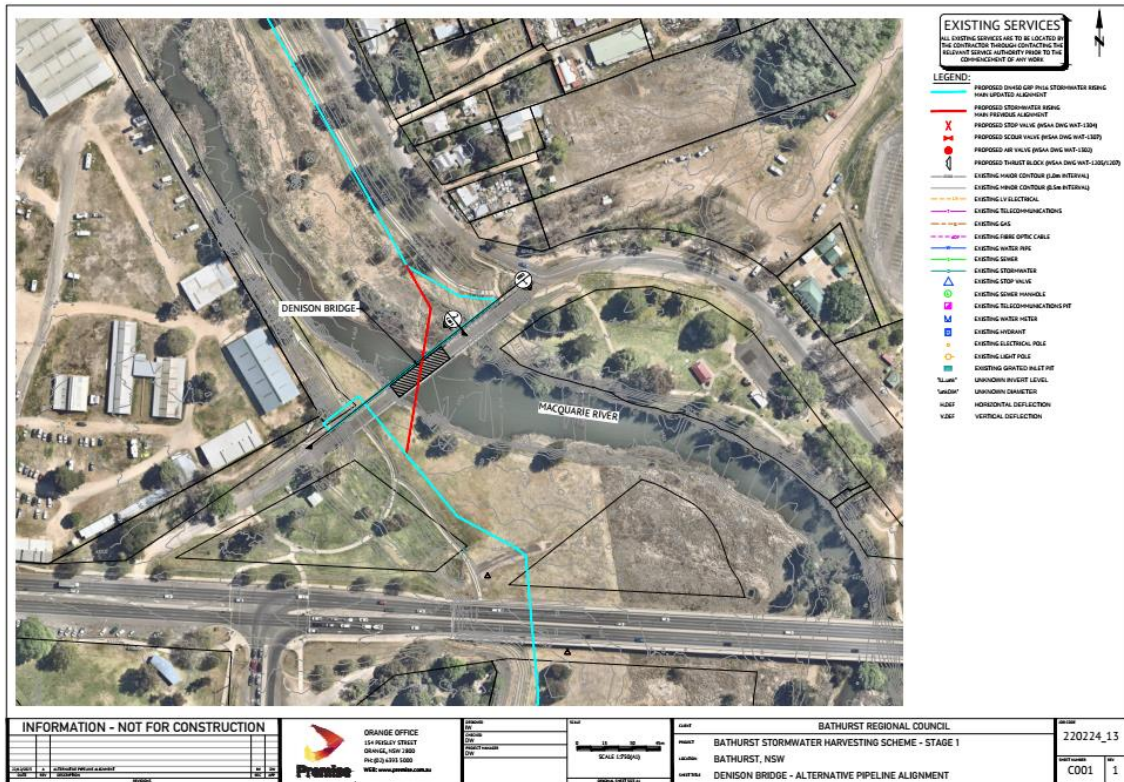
Drawing C001, Bathurst Stormwater Harvesting Scheme – Stage 1, Denison Bridge – Alternative Pipeline Arrangement. Source: Premise.
